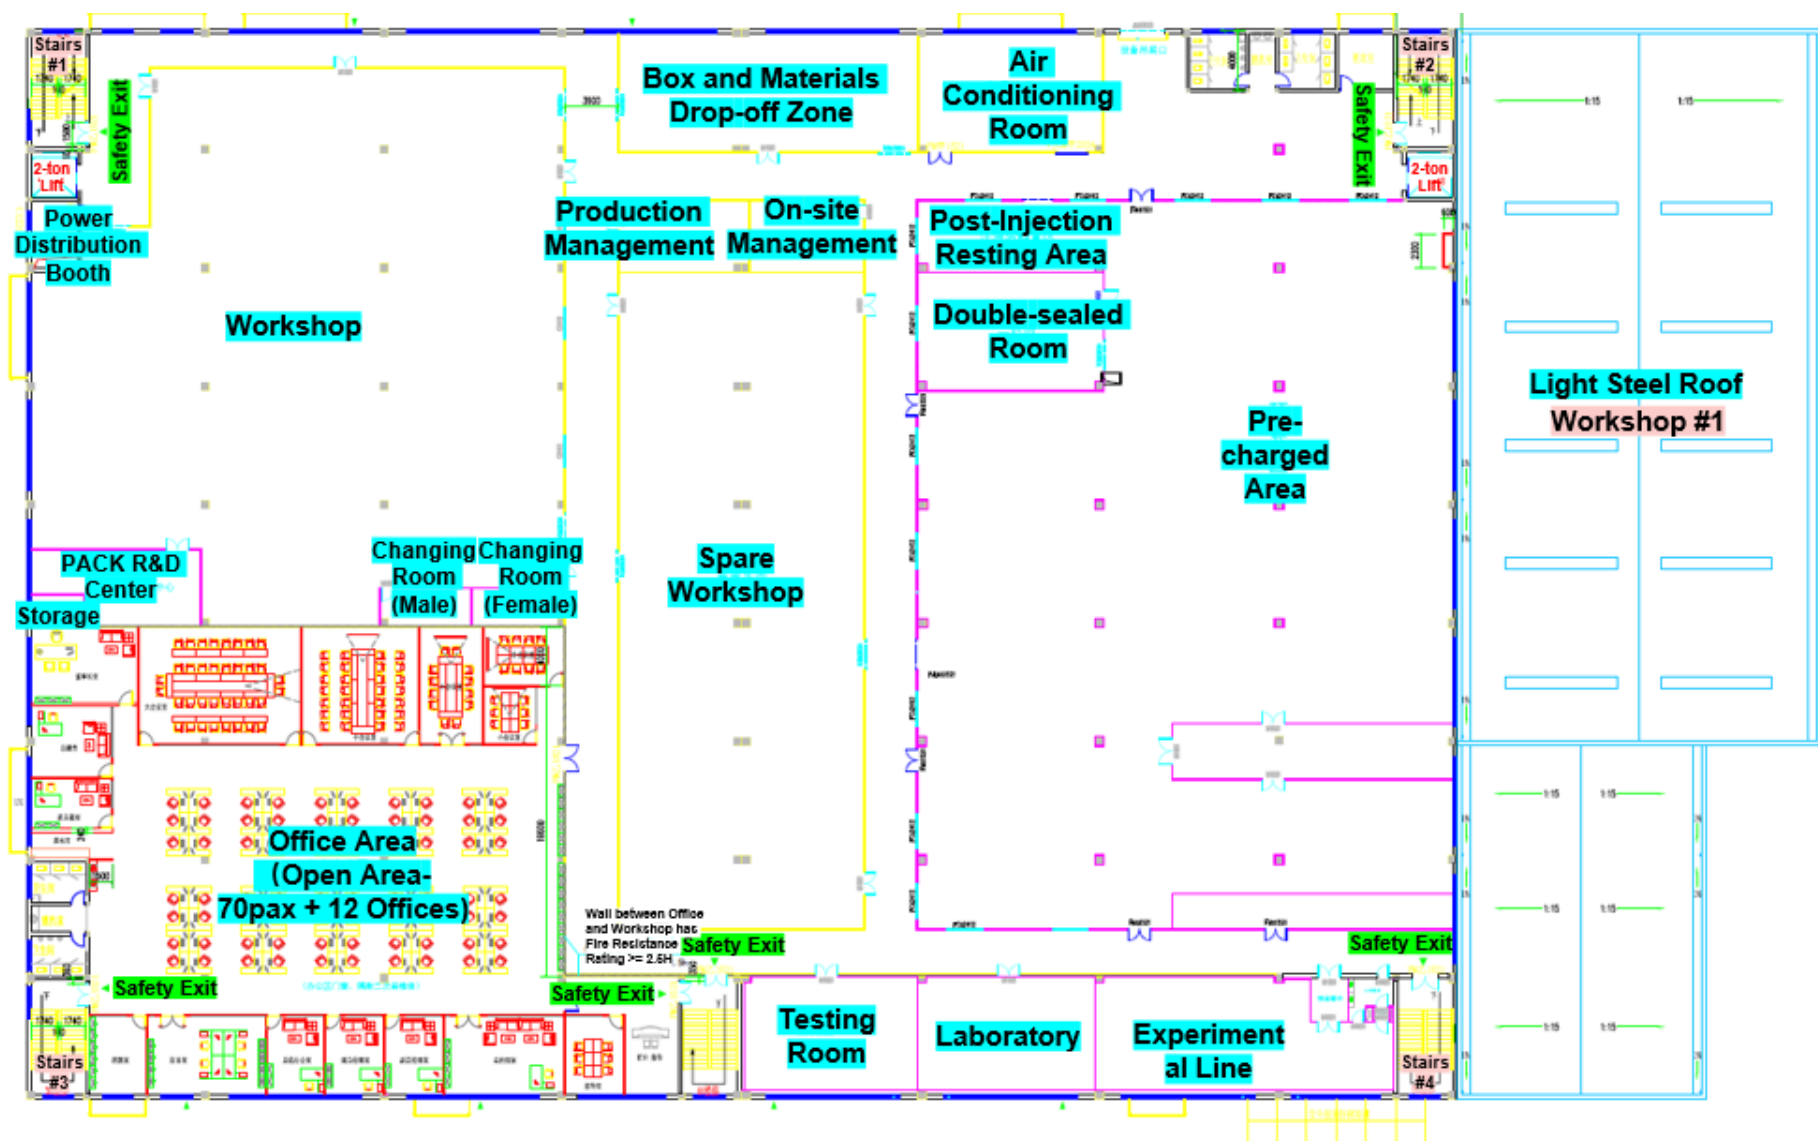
Level 2 Floorplan of Suzhou Durapower Battery Manufacturing Facility in China
